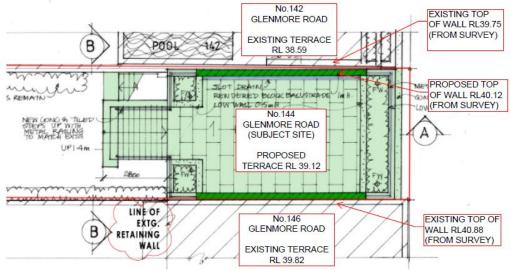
Plan View of the proposed roof terrace above garage. Base drawing: Kenström Design Pty Ltd
